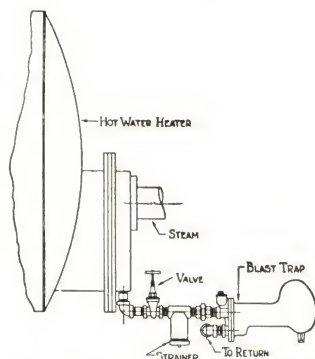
Blast Trap Connections to Hot Water Heater
